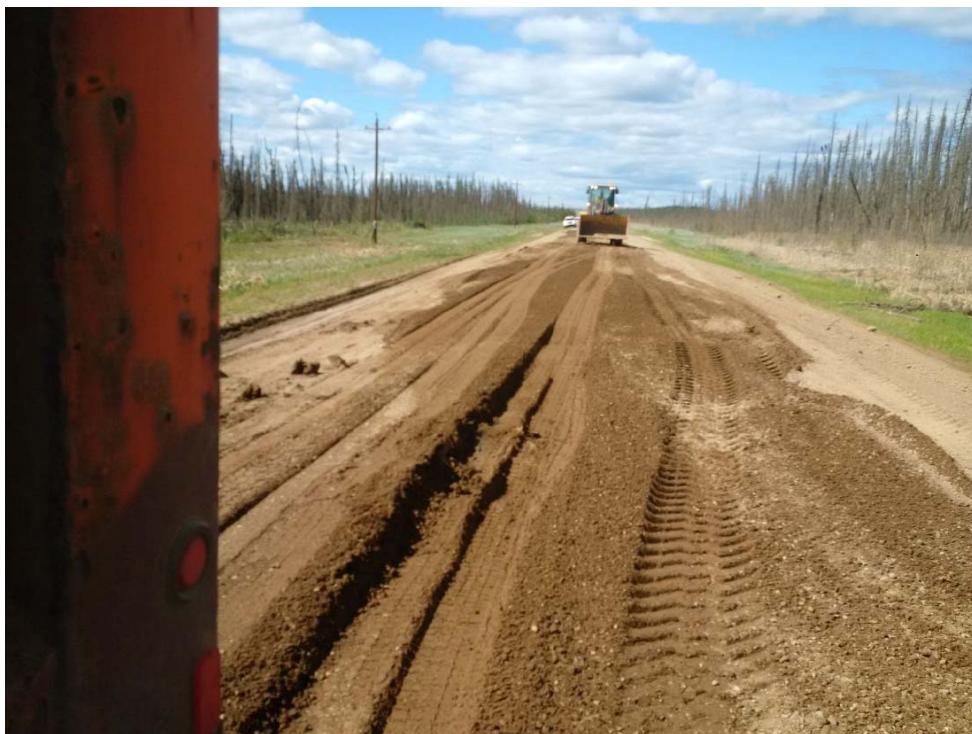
Looking west at rutting during gravel placement on May 30, 2018 (AT photo)
